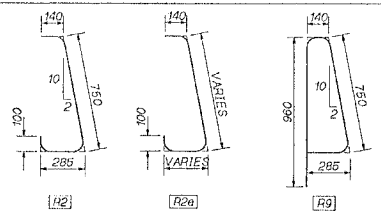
DETAILS FOR RETAINING WALL FOR REINFORCING NOT SHOWN SEE STD. PLAN D-1a & D-1b OR RETAINING WALL PLAN.
